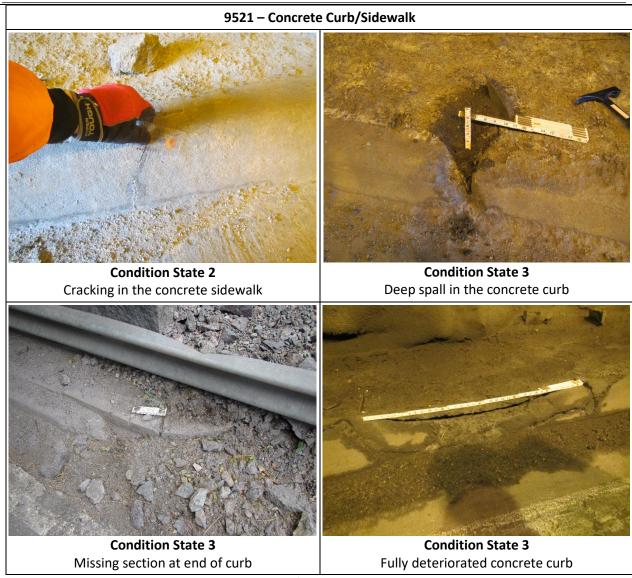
9521 – Concrete Curb/Sidewalk Condition Rating Example Photos
